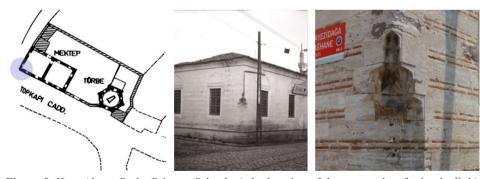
Kara Ahmet Pasha Primary School; a) the location of the corner chamfer in plan³³, b) Corner detail (URL 16), c) Corner detail (Author's archive, 2018).
